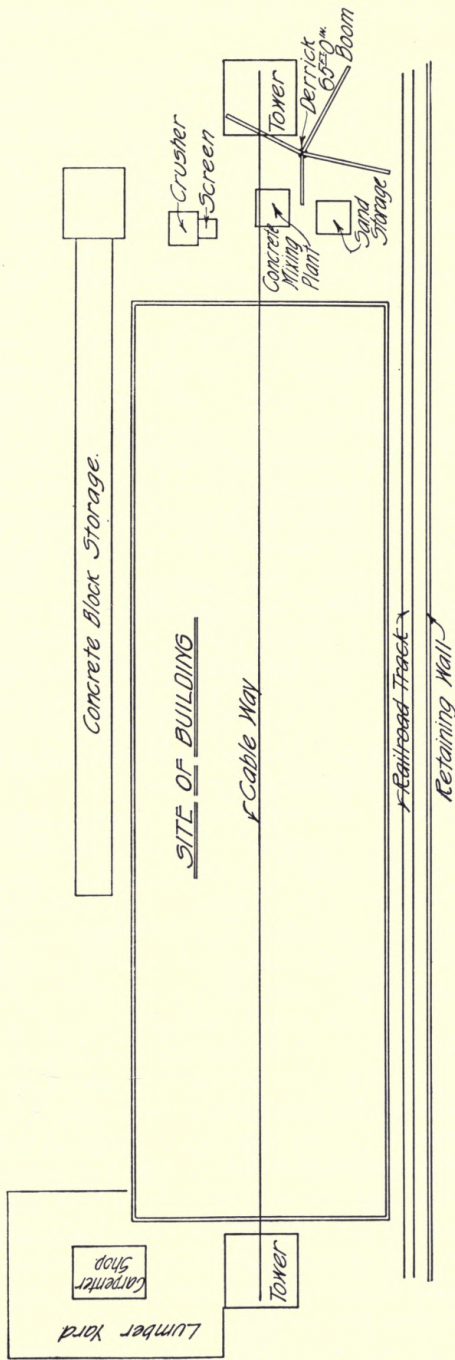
Plan of Construction Plant. (See p. 110.)
